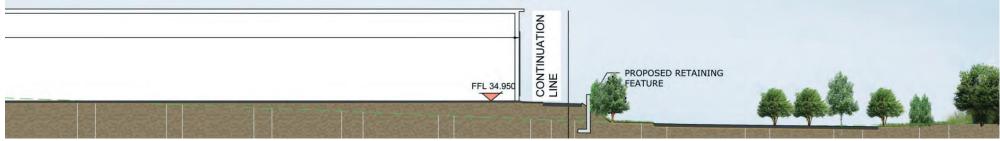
Section through proposed building, retaining feature and car park (NW to SE)
